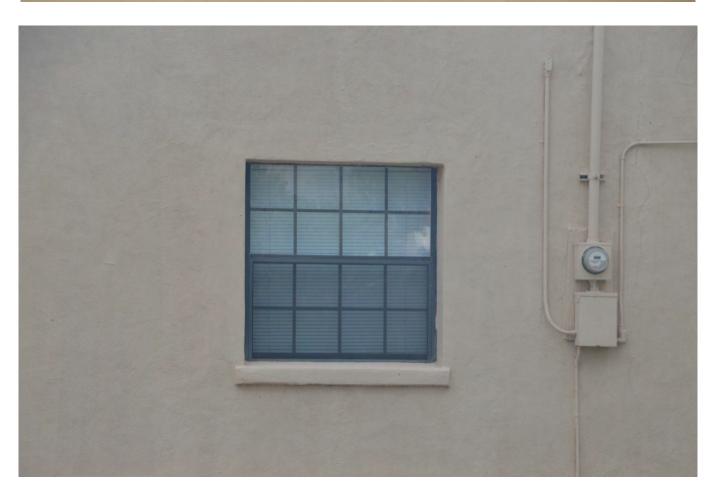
PHOTOS OF EXISTING STRUCTURE SHOWING SOME OF THE WINDOWS TO BE REPLACED
